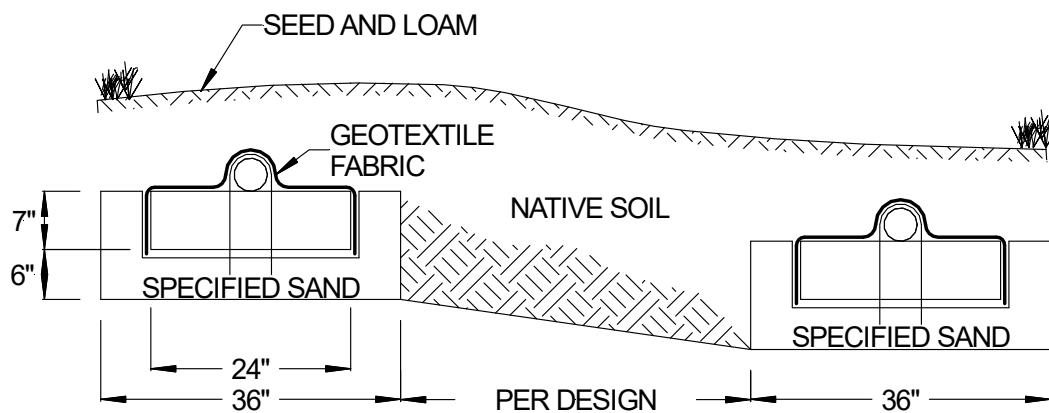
SECTION VIEW – TRENCH SYSTEM – SLOPING SITE
